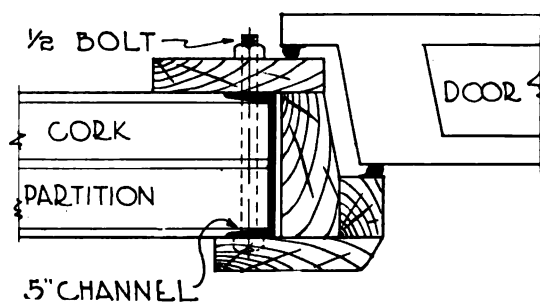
REFRIGERATOR DOOR JAMB BOLTED TO CHANNEL IRON BUCKS.
